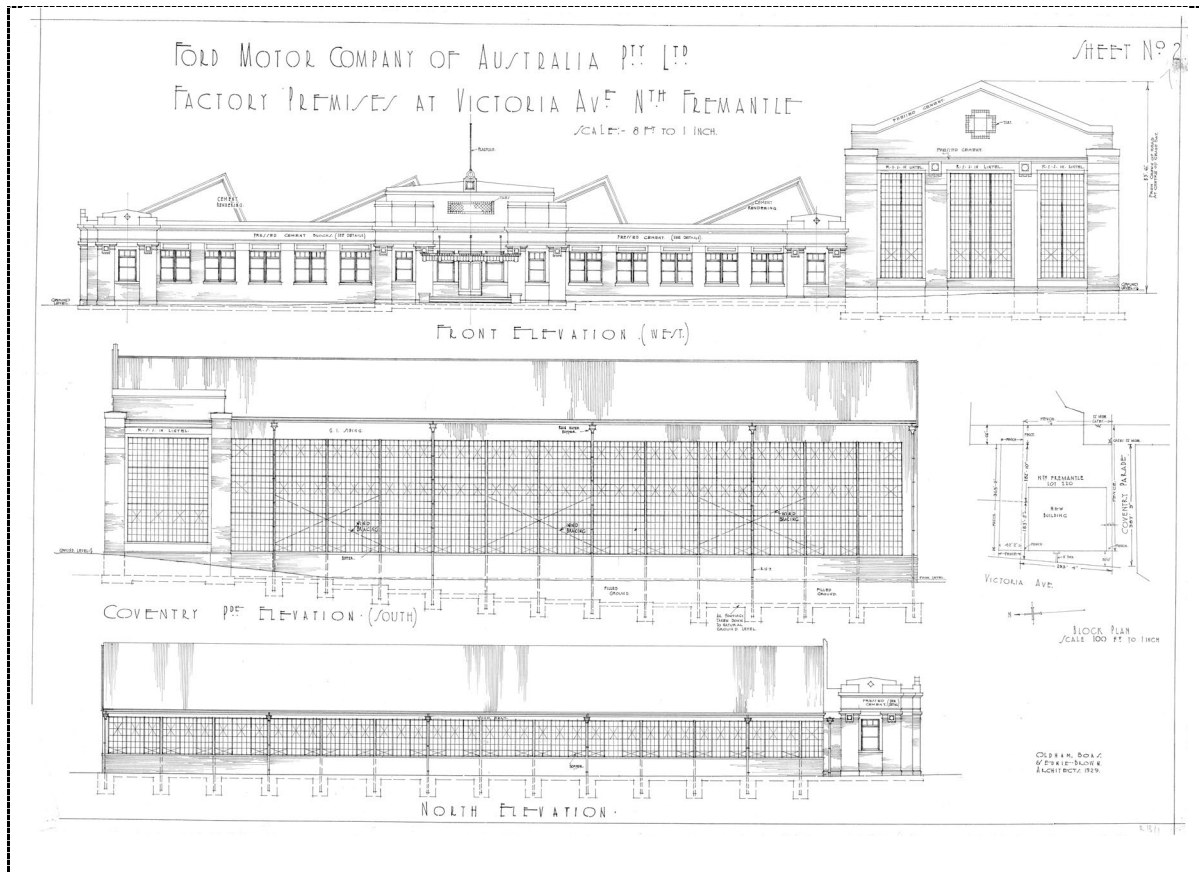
Site plan and elevations prepared by Oldham Boas and Ednie Brown for Factory Premises at Victoria Avenue, North Fremantle, 1929.
